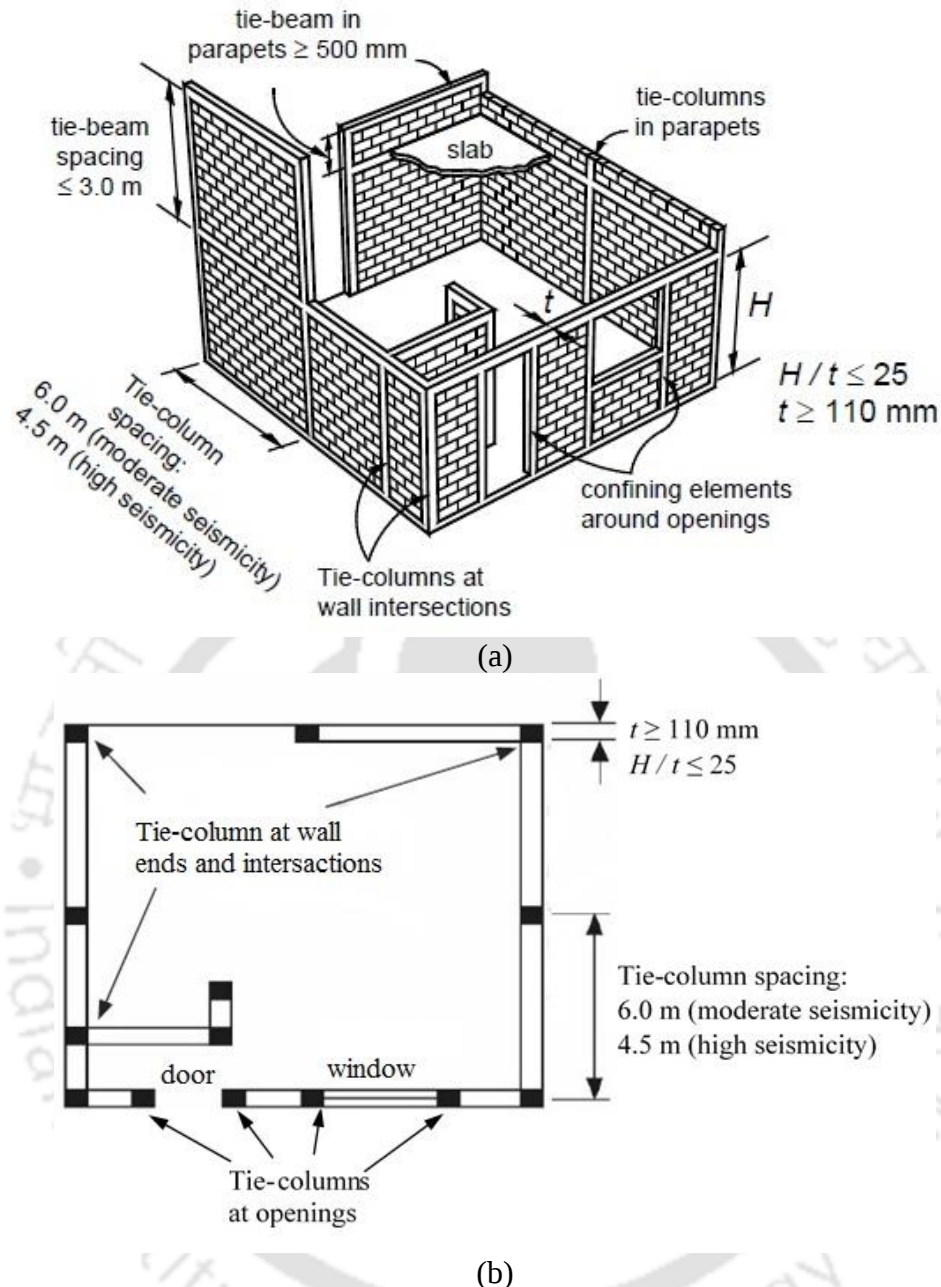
Key recommendations for non-engineered CM buildings: (a) Elevation, and (b) Plan (Meli et al. 2011).
